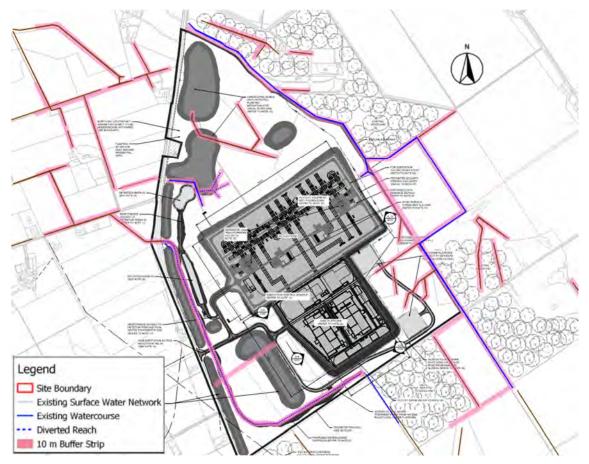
Location Plan Showing the Proposed Permanent Development Overlain with Drainage
